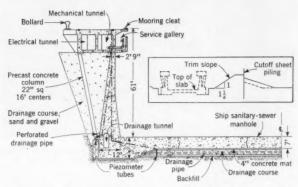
Half section through the Bremerton drydock. Drainage to relieve hydrostatic pressure permits use of thin walls and floor.
